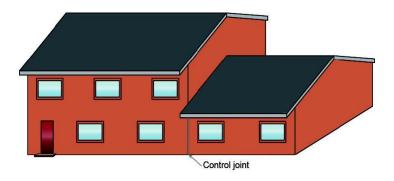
A Control Joint at a change in an external wall separates a long wall into separate panels that reduce stress.
